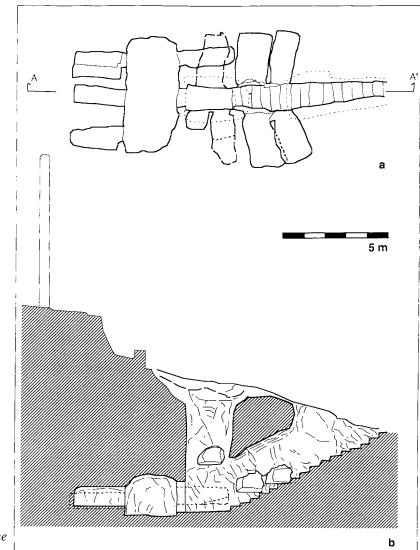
Plan and section of the 'Tomb of Bazen'.
